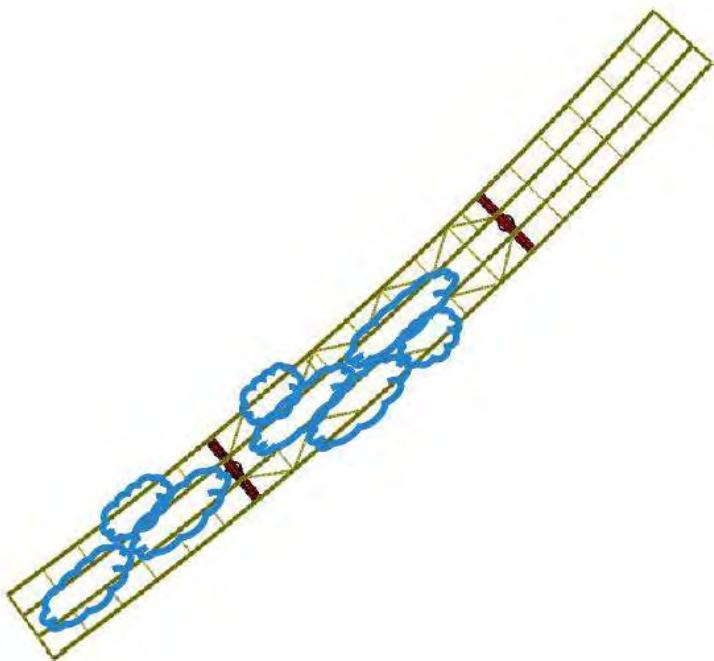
Framing plan showing remaining members following pier cut prior to live load
